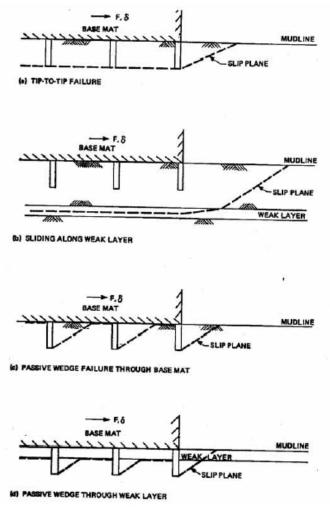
Failure modes of skirted foundations (Lam et al, 1987)
